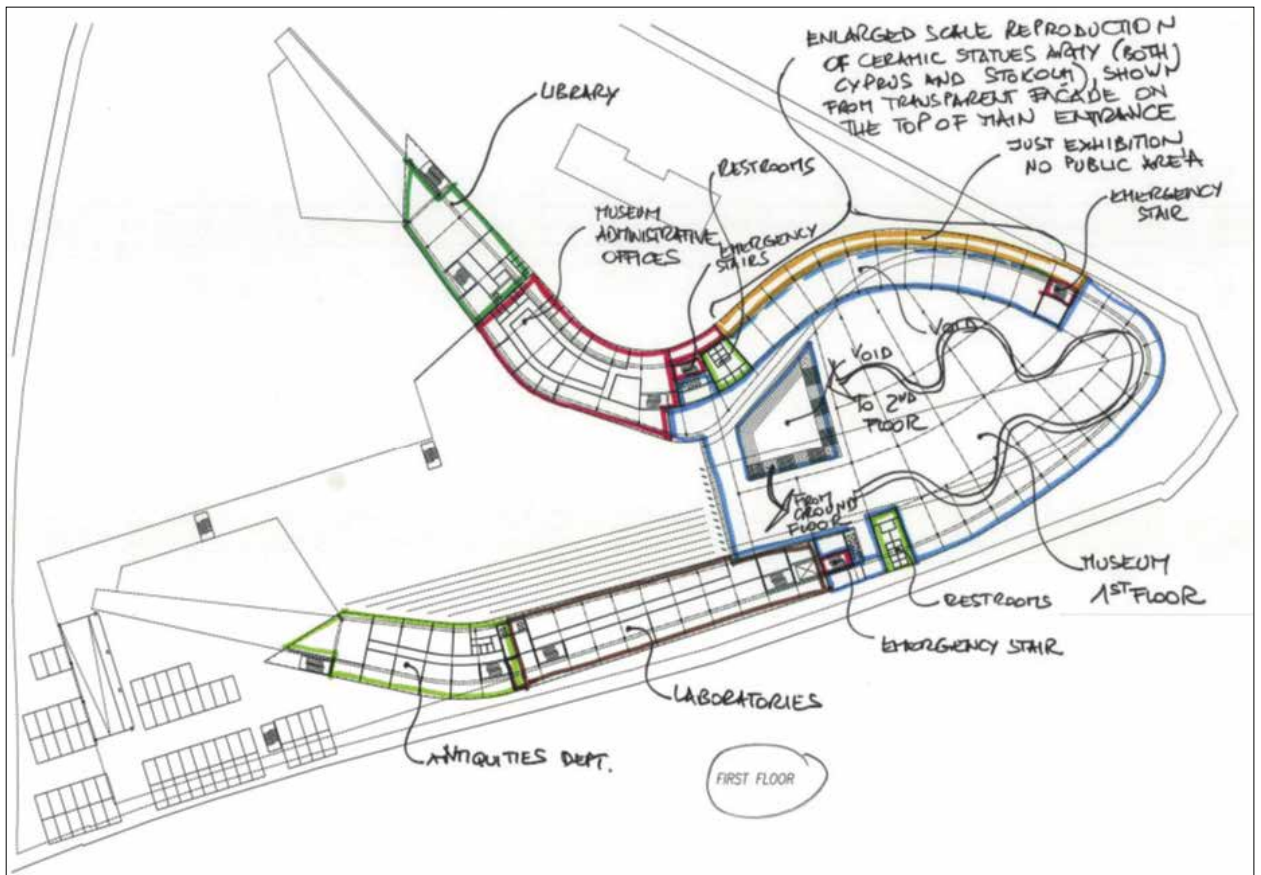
First Floor sketch design during the first stage of the architectural competition.
